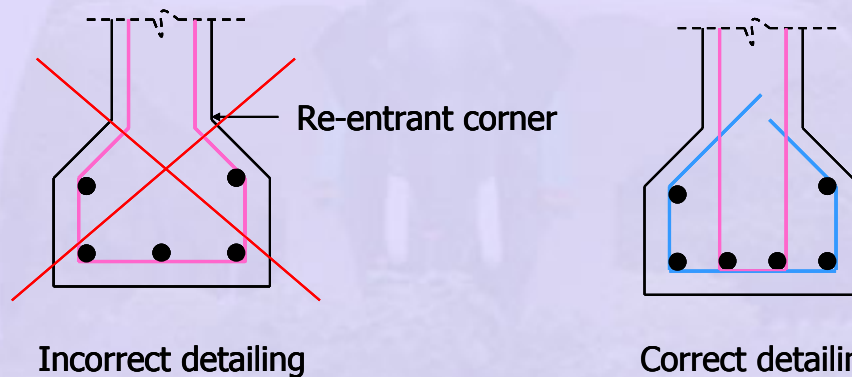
Cross-section of the bottom flange of a beam showing stirrups
